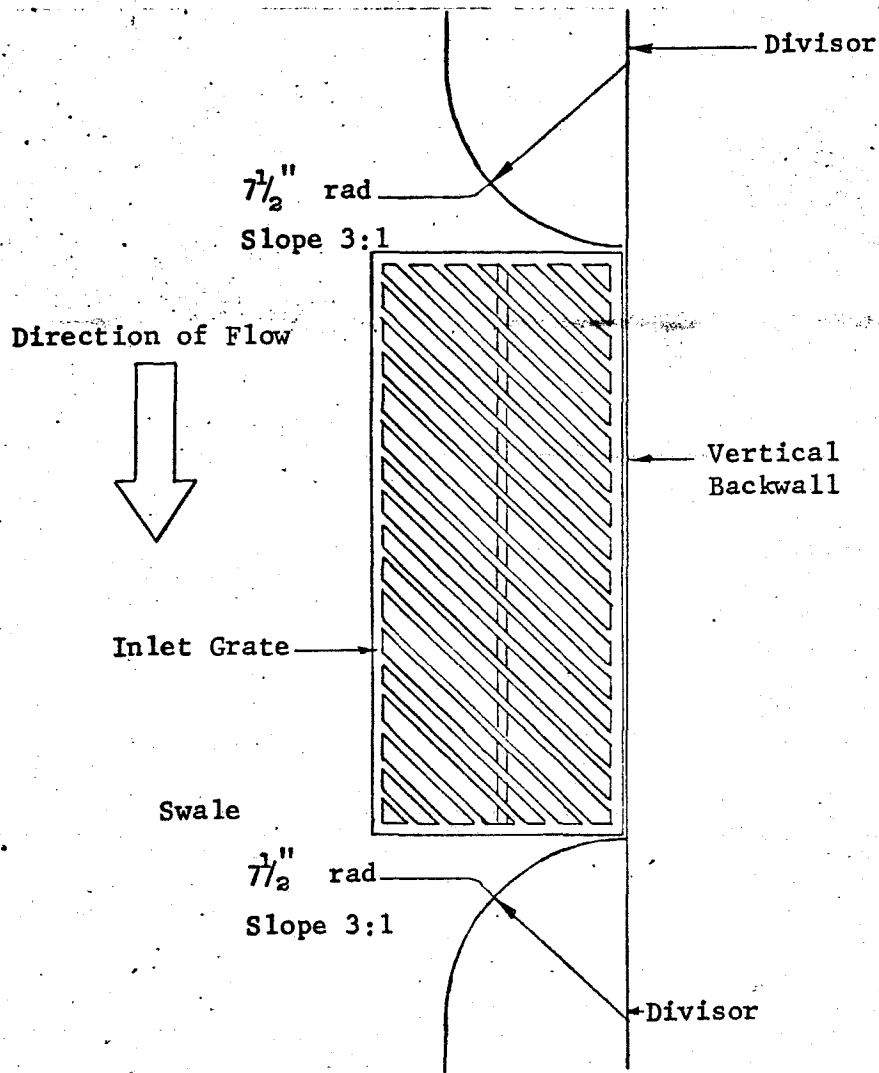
Installation for Type 4-Ft. Special Inlet and Type 6-Ft. Special Inlet
